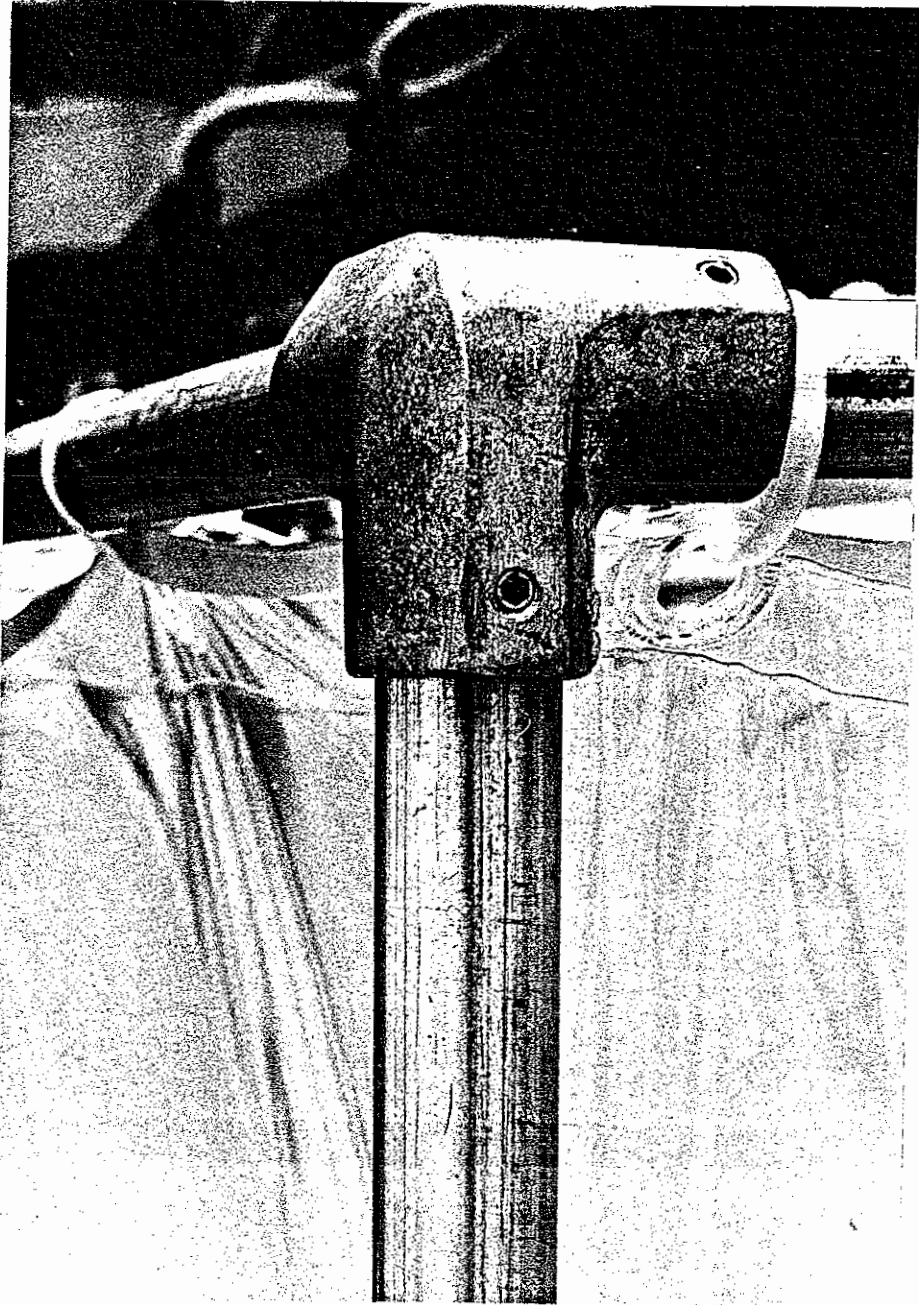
Photo : Detail of the suspension of a tent and its connections.
